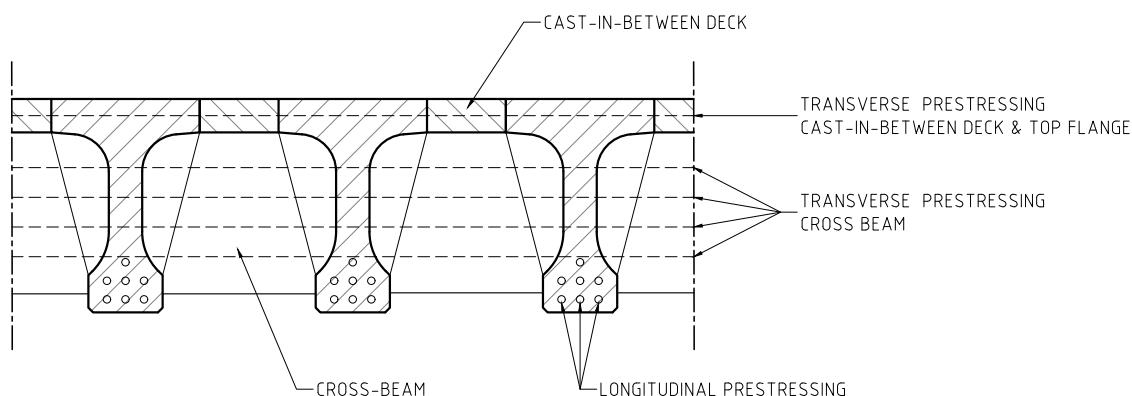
Typical cross section of prestressed T-beam bridge with cast in between deck
